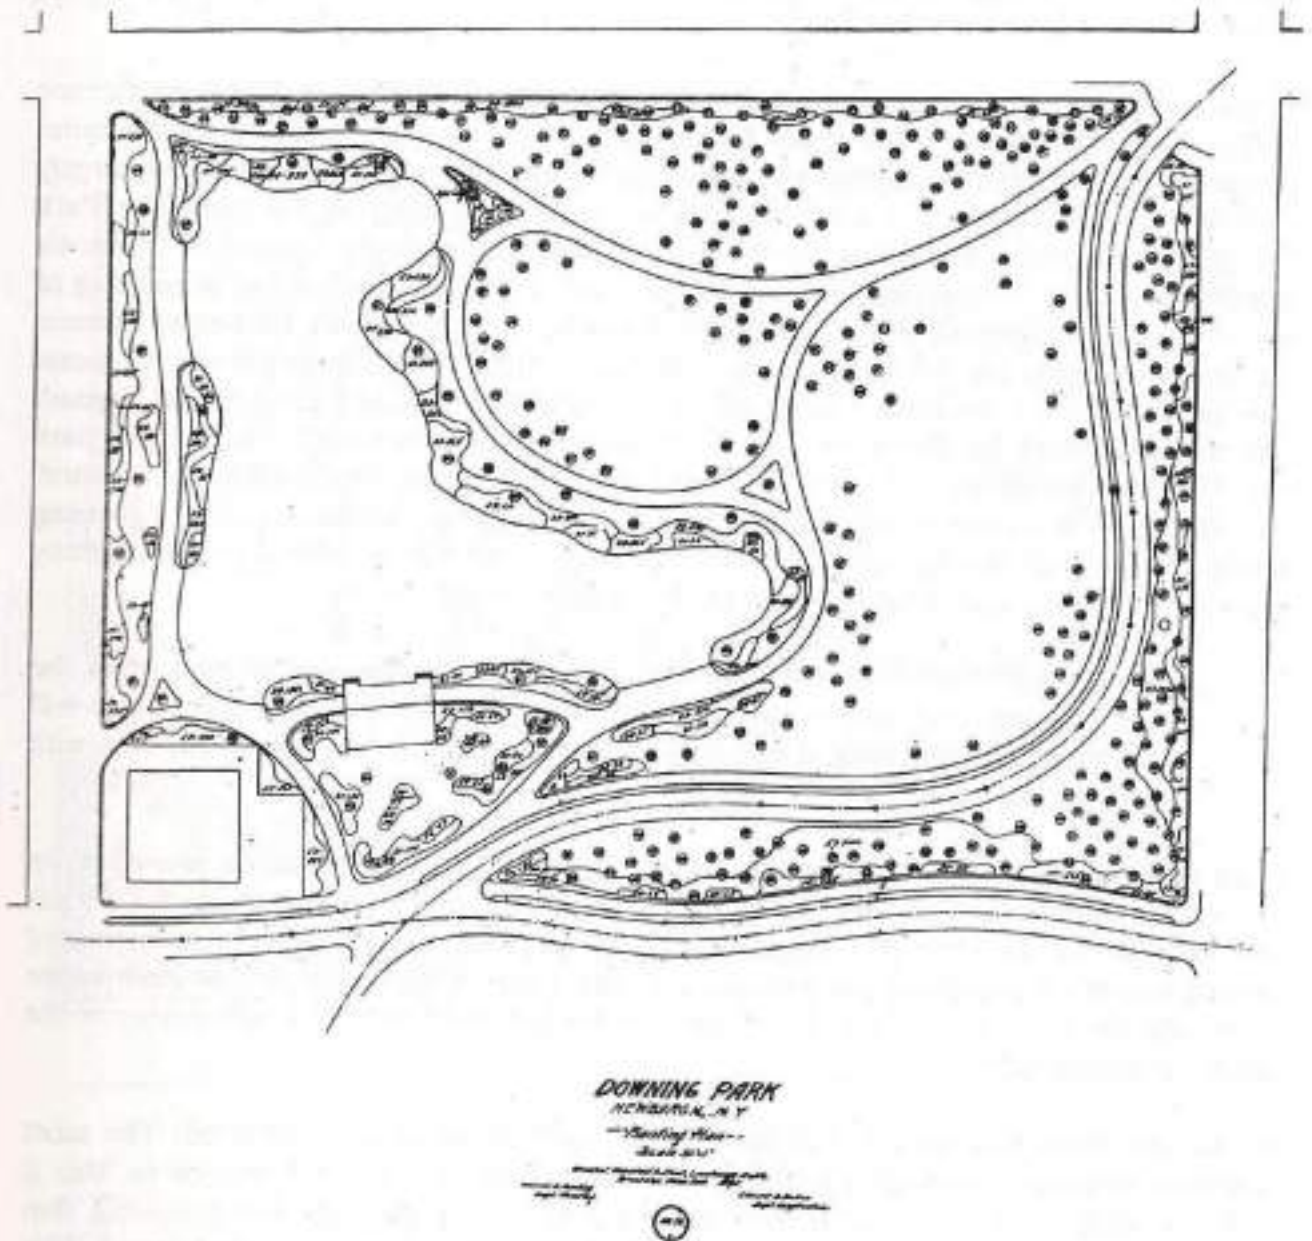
Downing Park, Planting Plan, No. 23, for the lower park. Olmsted Olmsted & Eliot, 1895. FLONHS
